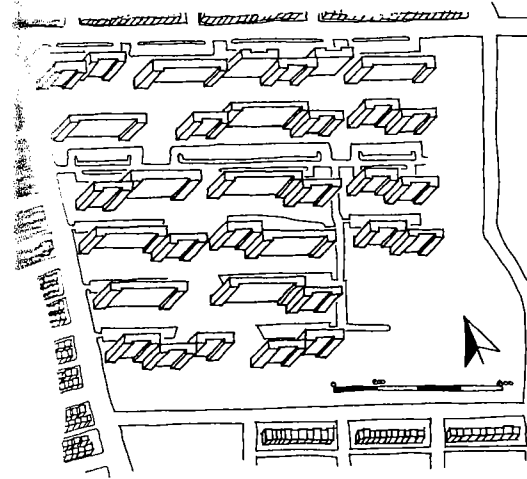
Site Plan of Pruitt-Igoe, St. Louis, Missouri. Built in 1955; eleven-story buildings; 2,764 apartments; fifty dwelling units per acre. This drawing illustrates the marked contrast between project buildings and surrounding residential community.
